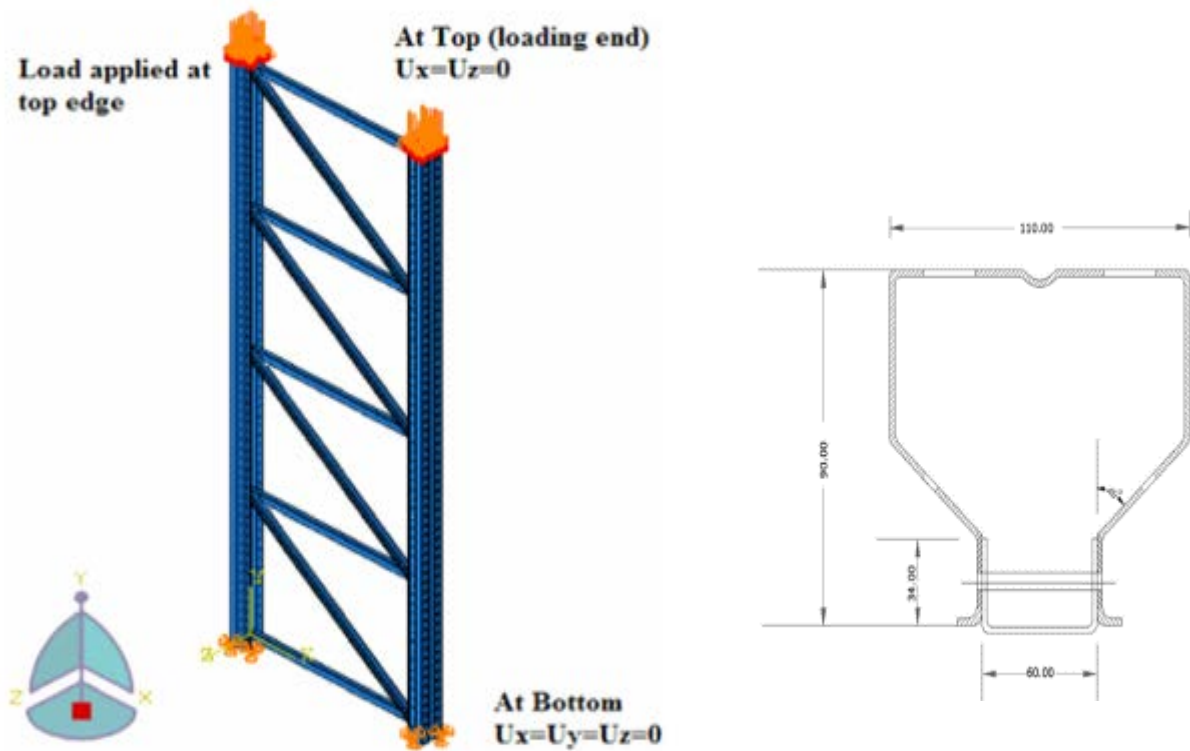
Torsional strengthened MW/HW upright section with channel stiffener and its boundary condition rack system (Thombare et al., 2016).
